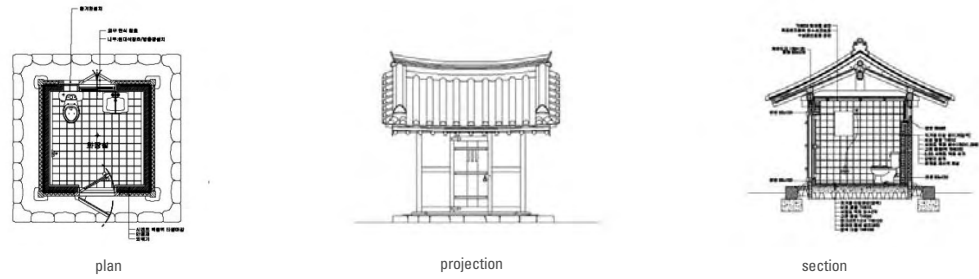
Design Guidelines for Modification of Layout and Structure (new construction of bathroom as a tile roofed annex)
